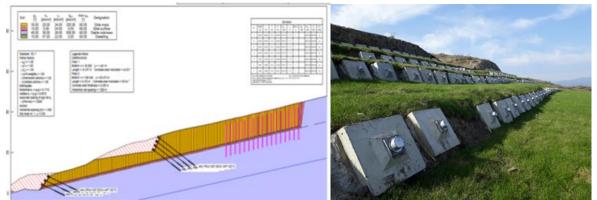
Project of anchor reinforcement of the Vashlijvari landslide slope and its fragment
